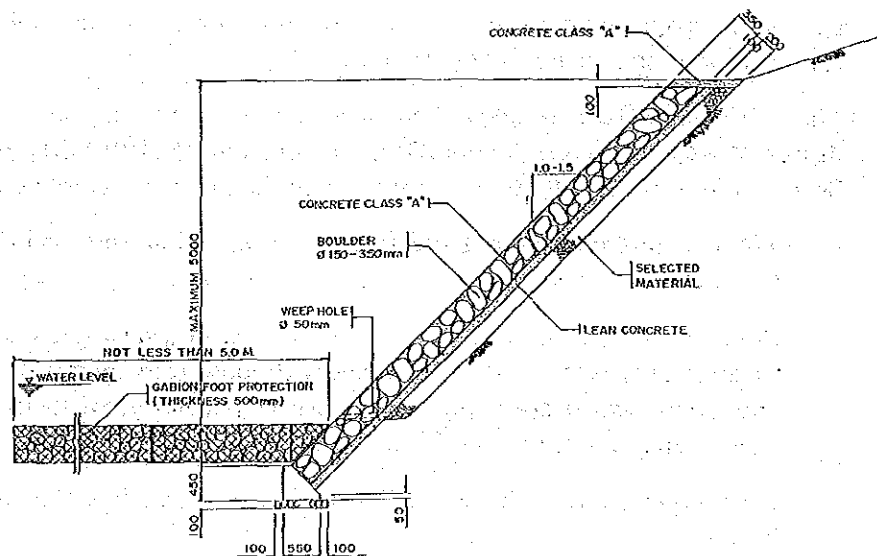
STONE PITCHING REVETMENT AND GABION FOOT PROTECTION
